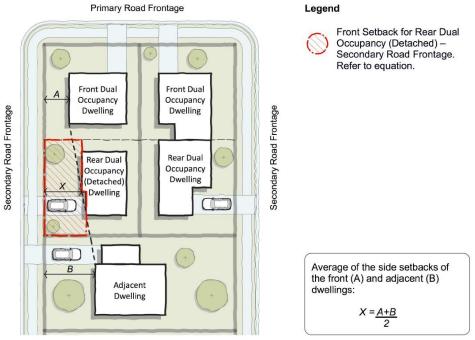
Setback - Rear dual occupancy (detached) dwelling (secondary road frontage)
